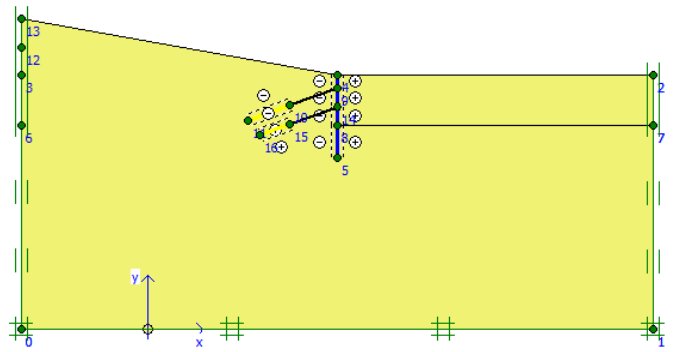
Schematic of Anchored Sheet Pile Wall and inclination of ground surface ( $\psi$ ) Analyzed for add two anchors
